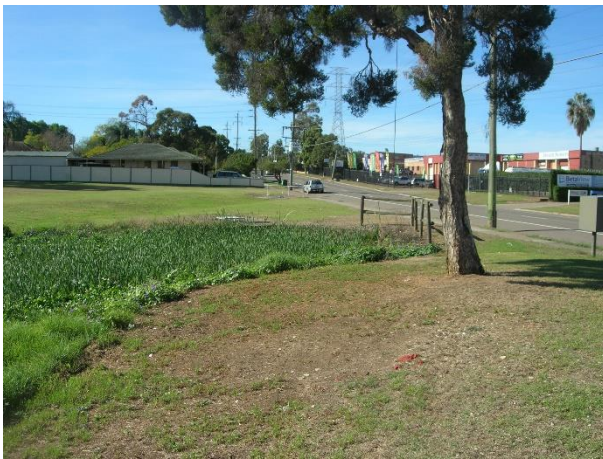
Primary trunk drain outlet at Kurrajong Rd showing stagnant water
